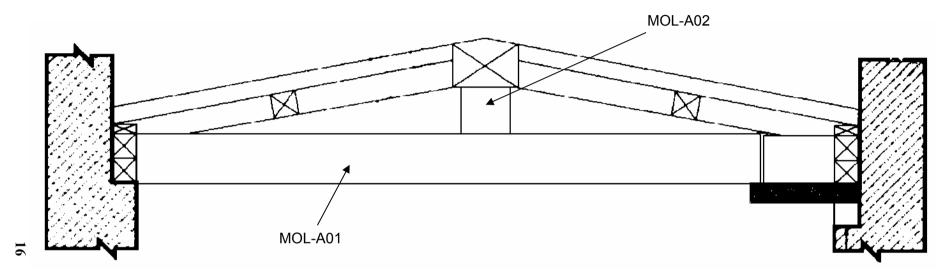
Roof truss, north truss, showing the location of samples MOL-A01 and MOL-A02 (Hockley and Dawson)
